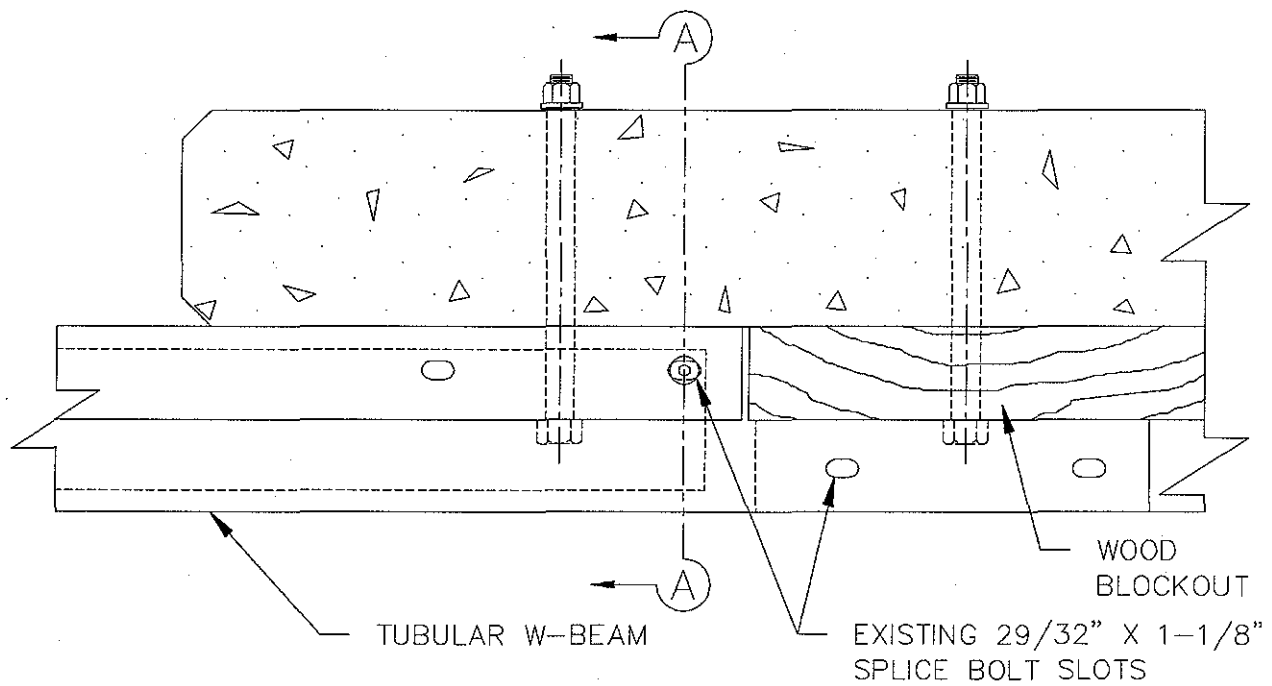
TUBULAR W-BEAM CONNECTION TO SAFETY SHAPE FOR RETROFIT INSTALLATION
